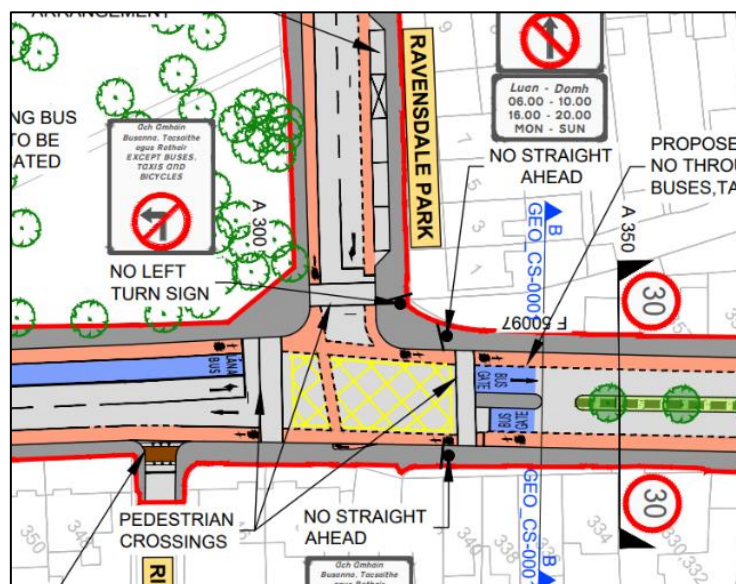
Junction of Kimmage Road Lower and Ravensdale Park
